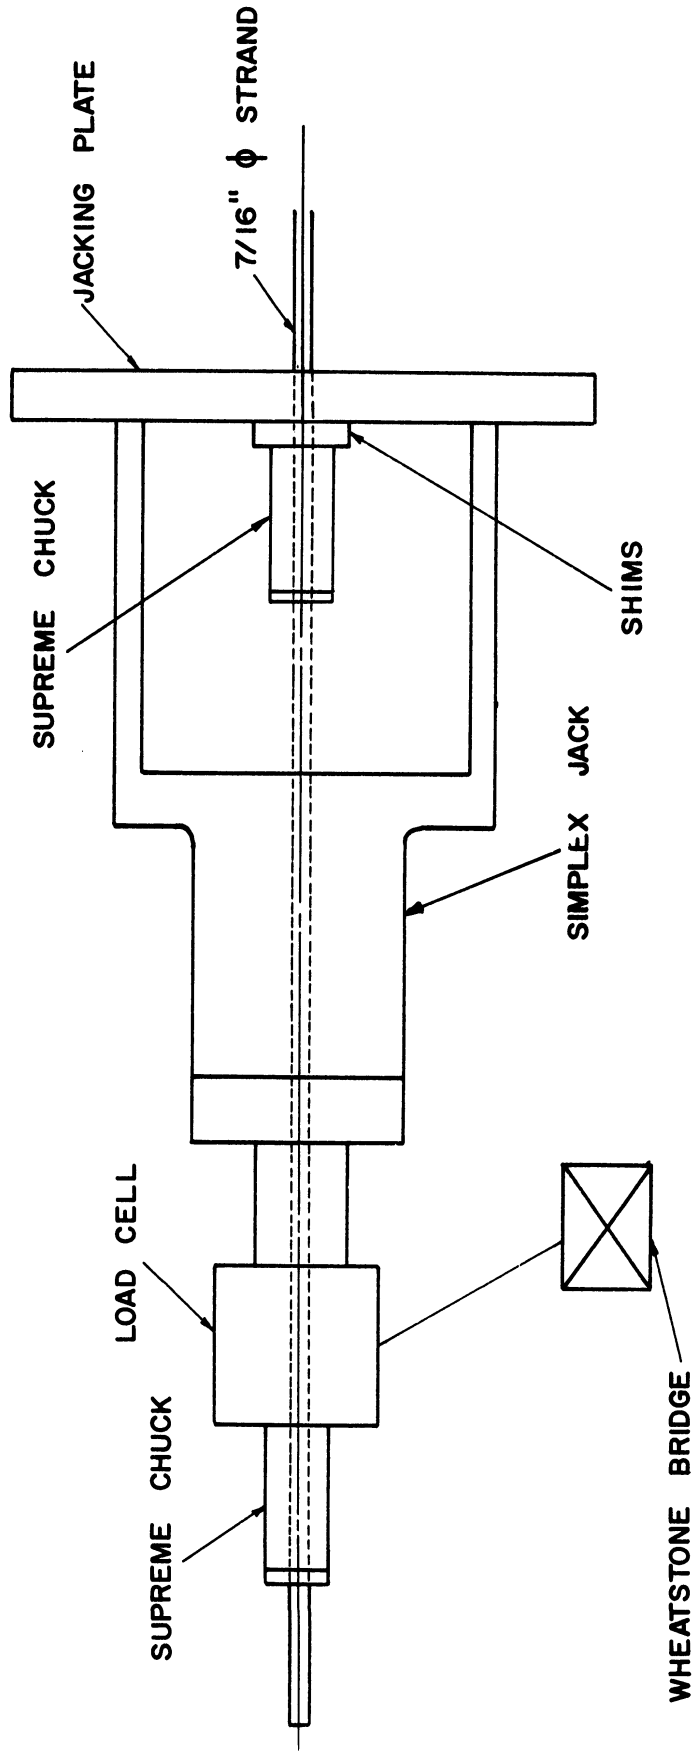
Hydraulic Jack, Load Cell, Shims and Strand Chuck Arrangement Used in Prestressing the Strand.
